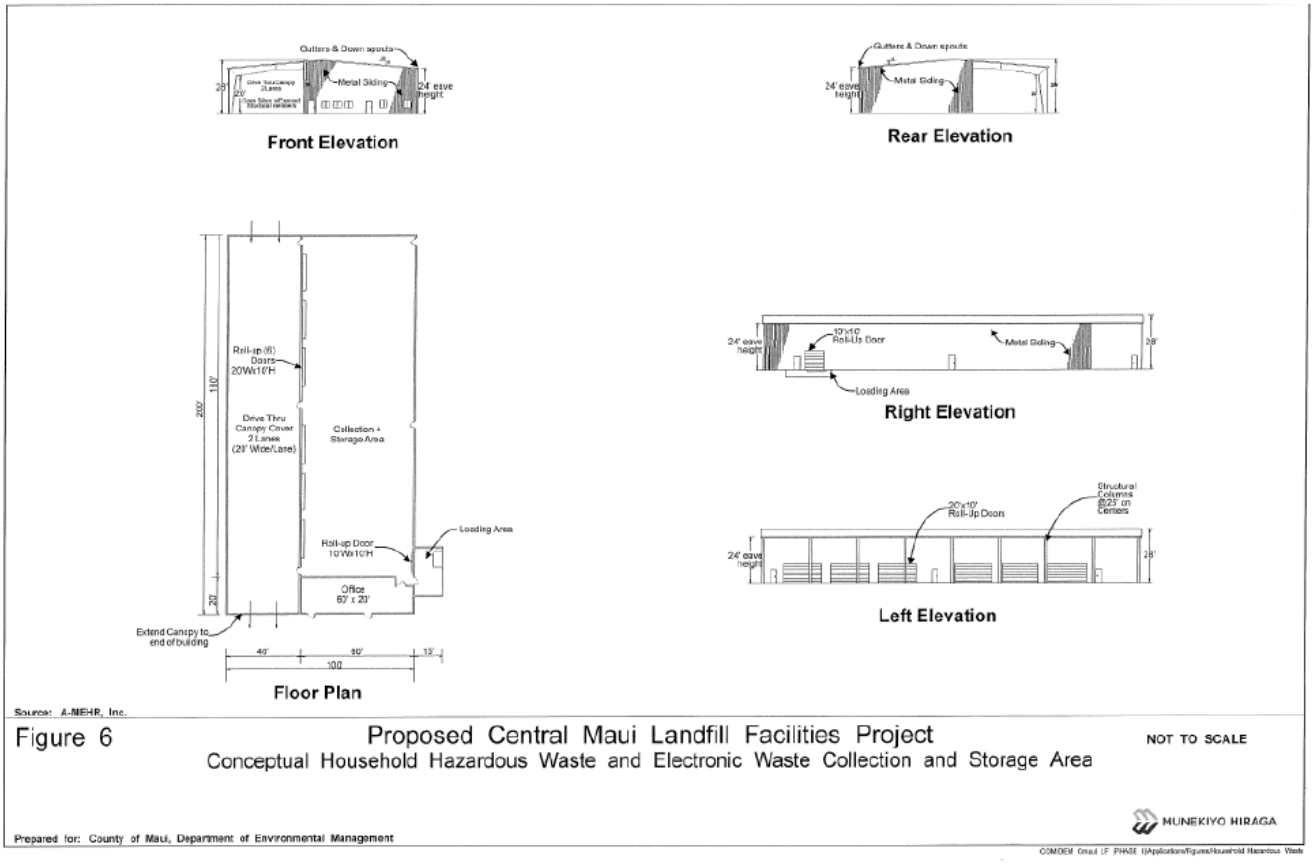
Proposed HHW and E-Waste Collection Facility
